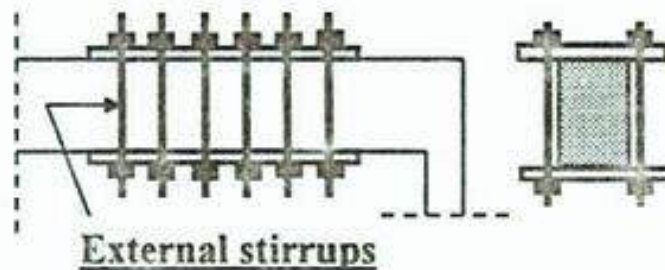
Addition of external stirrups (Source: Ziara, 2014).
